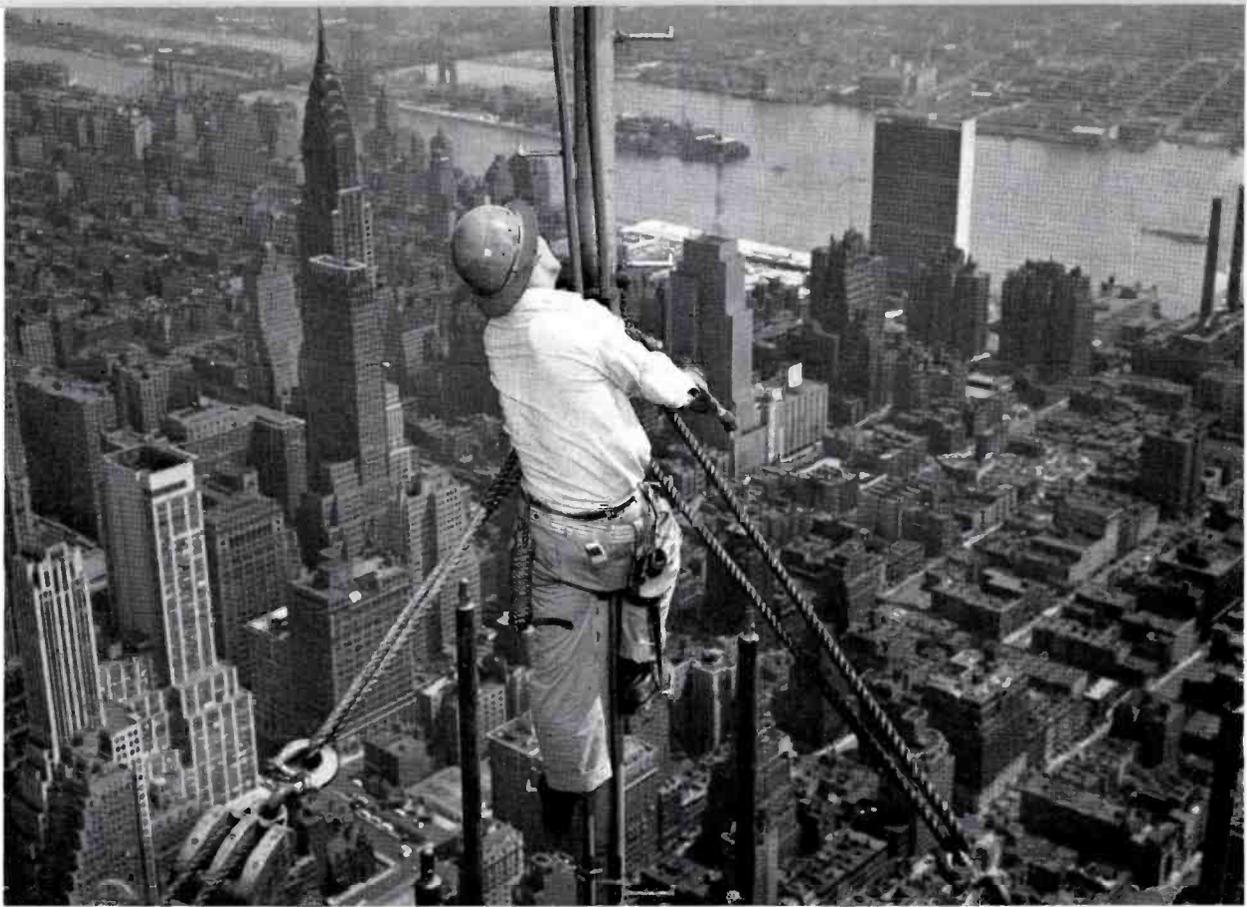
(above). In this photo, Ray Corbet, American Bridge Company foreman, fastens lines to the 75-foot NBC temporary antenna which towers above: (left to right) the Chrysler Building with WCBS-TV antenna, Daily News Building with WPIX tower and the United Nations Building.
